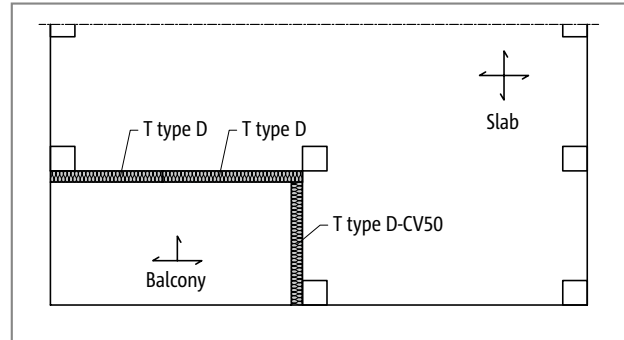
Schöck Isokorb® T type D: Use in flat slabs
